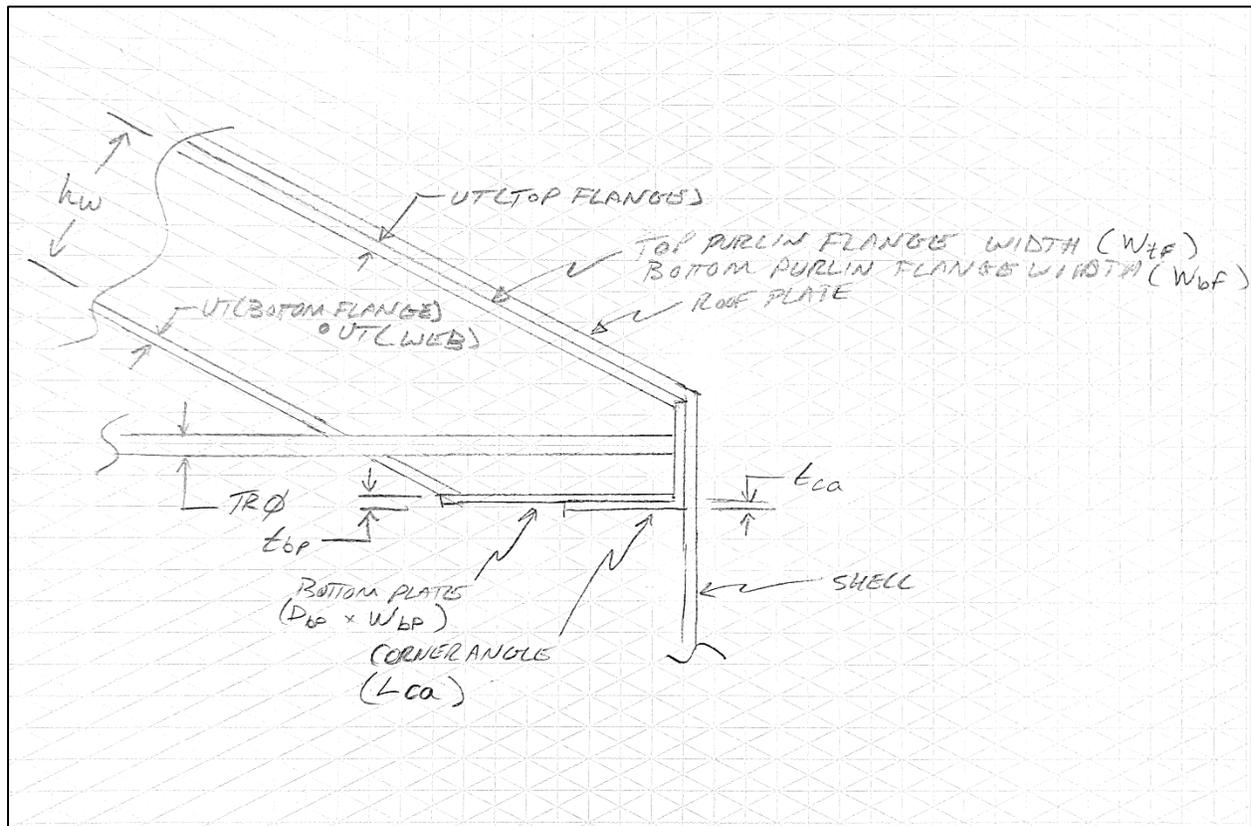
Example sketch roof purlin to roof and shell connection – new sketch to be produced if missing dimensions/structural elements are observed at site. Dimensions and UT locations identified.
